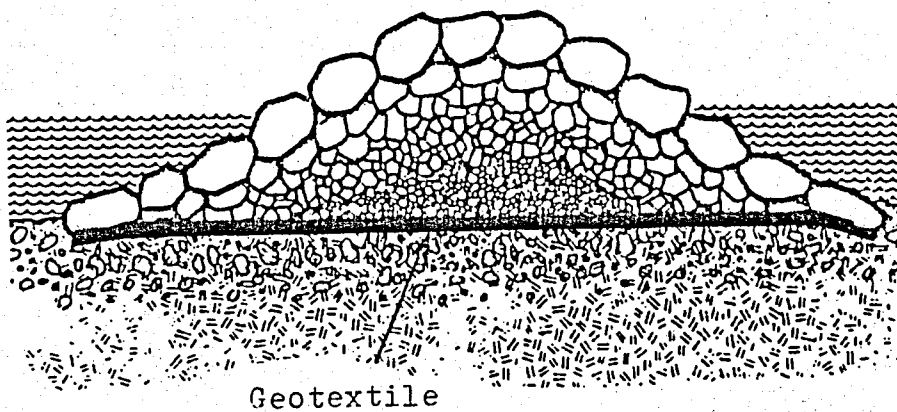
THE USE OF GEOTEXTILE IN OFFSHORE BREAKWATER
